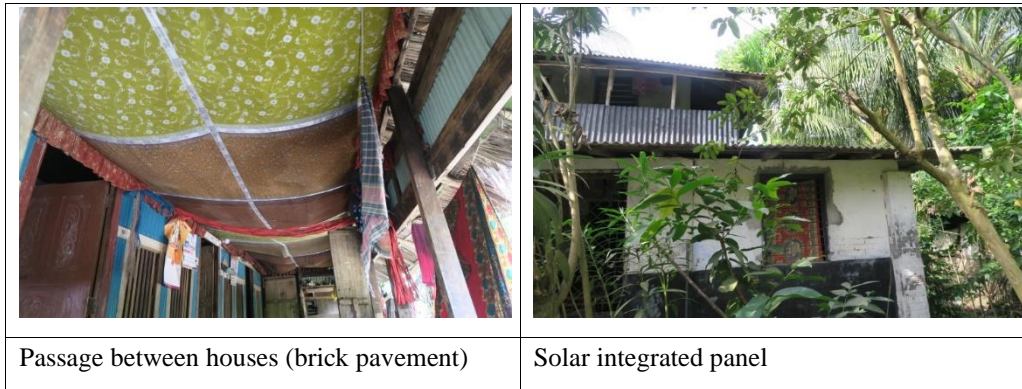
IMPROVED EAVES AND MASONRY BRICK HOUSE
